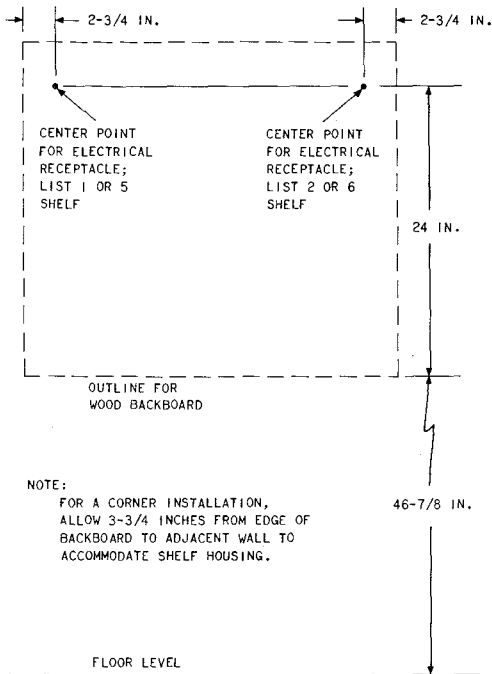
Locating The Hole For Electrical Receptacle Behind Backboard
